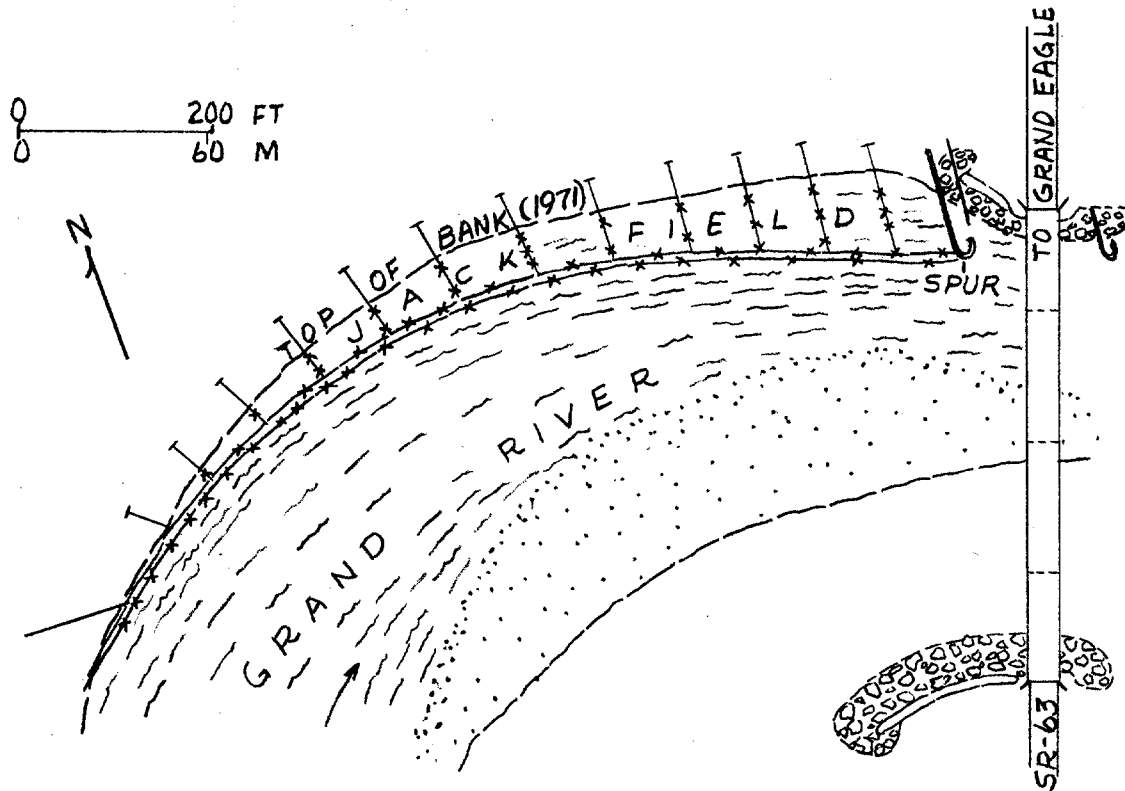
Plan sketch showing countermeasures installed at SR-63 crossing in 1971.
